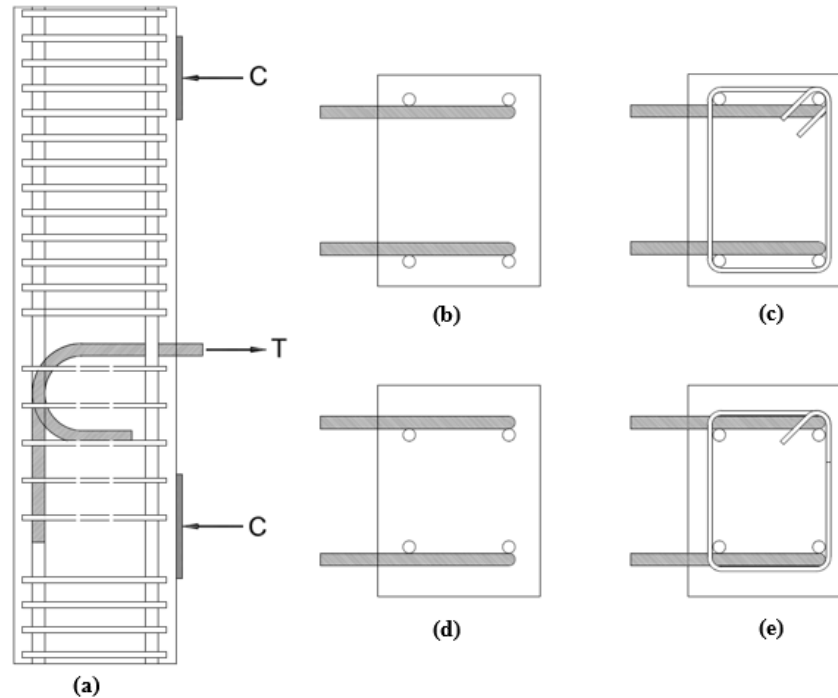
Schematic of specimens (a) side view of specimen (b) cross-section of specimen with hooks inside column core and without confining transverse reinforcement (c) cross-section of specimen with hooks inside column core and with transverse reinforcement (d) cross-section of specimen with hooks outside column core and without confining transverse reinforcement and (e) cross-section of specimen with hooks outside the column core and with confining transverse reinforcement
